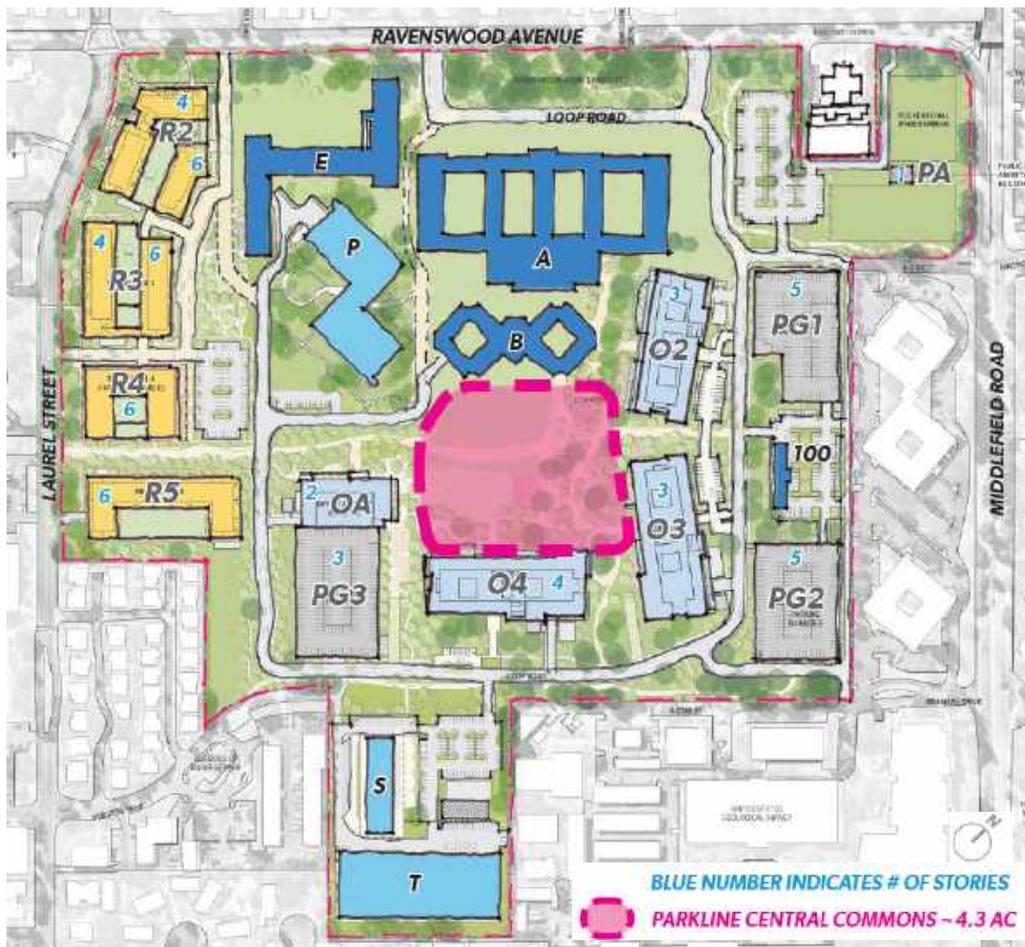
Preservation Alternative 3 site plan overlaid on Project. Source: STUDIOS Architecture, "Lane Partners Parkline: Historic Resource Evaluation – Site Plan Alternatives: Parkline Central Commons Areas," September 7, 2023. Legend edited by Page & Turnbull.
